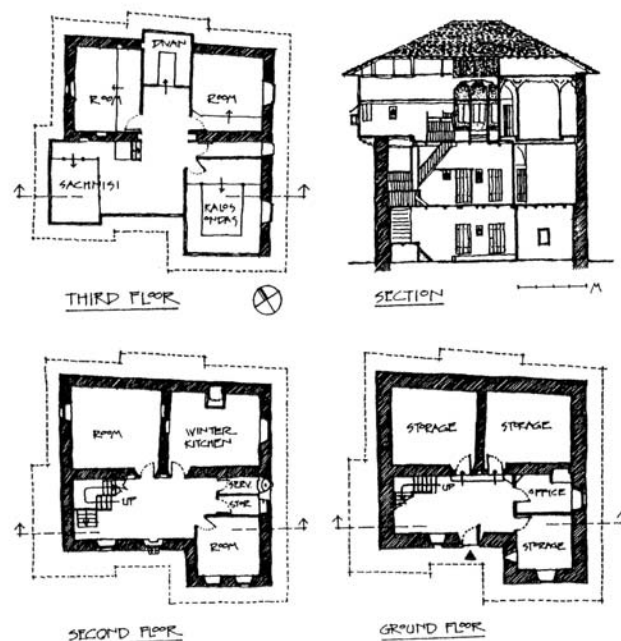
Plans and section of a typical dwelling in northern Greece designed and built by the builder’s guild. Drawing copyright 1993 Ronald Walkey, used with permission.
